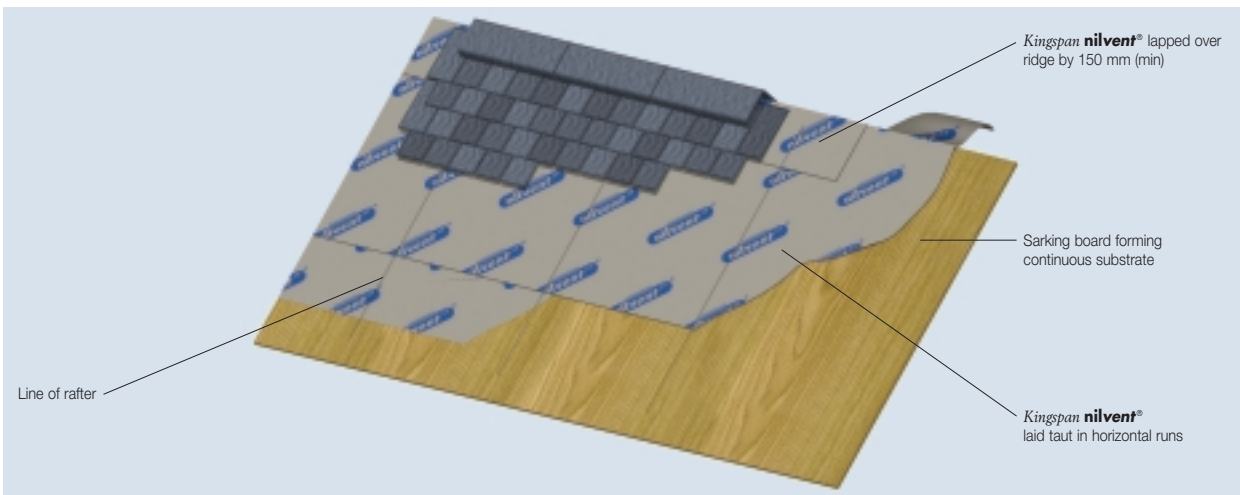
Ridge – Fully Supported Horizontal Installation with Natural Slates
